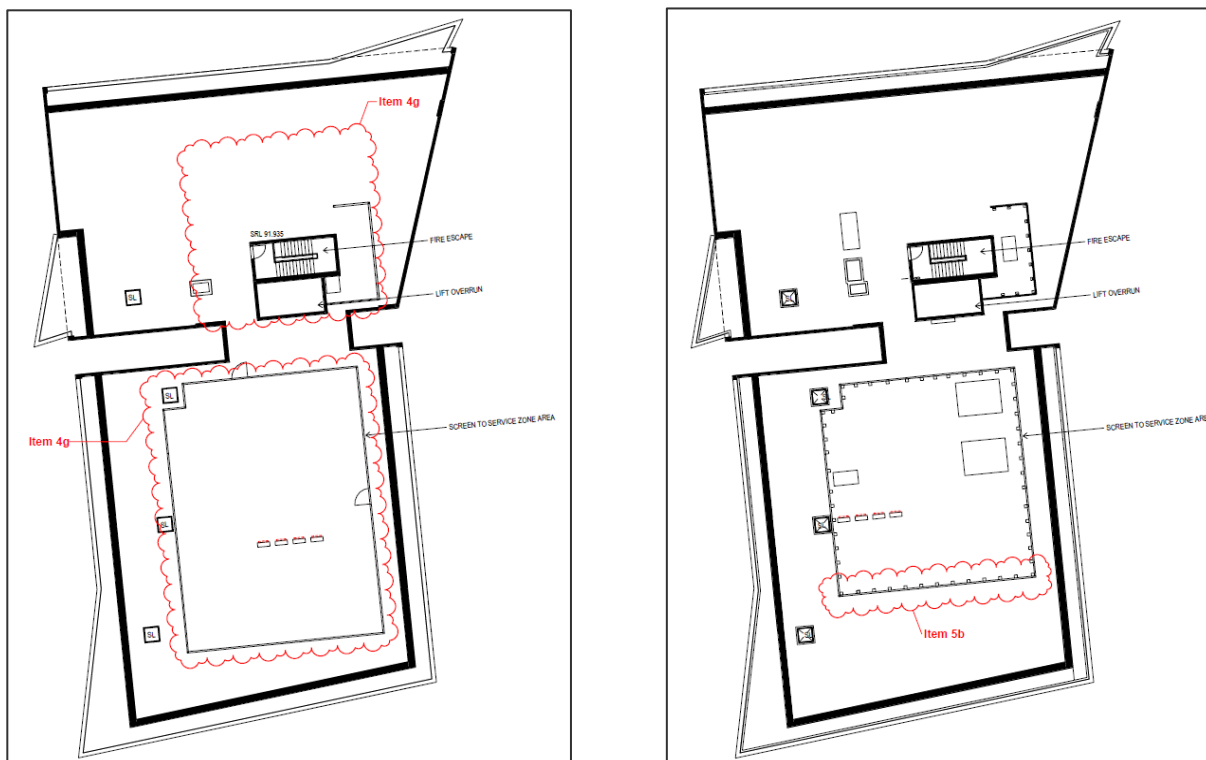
| Approved (left) and proposed (right) amended roof plant screen on Level 24 Building 5 (Source: Applicant)
